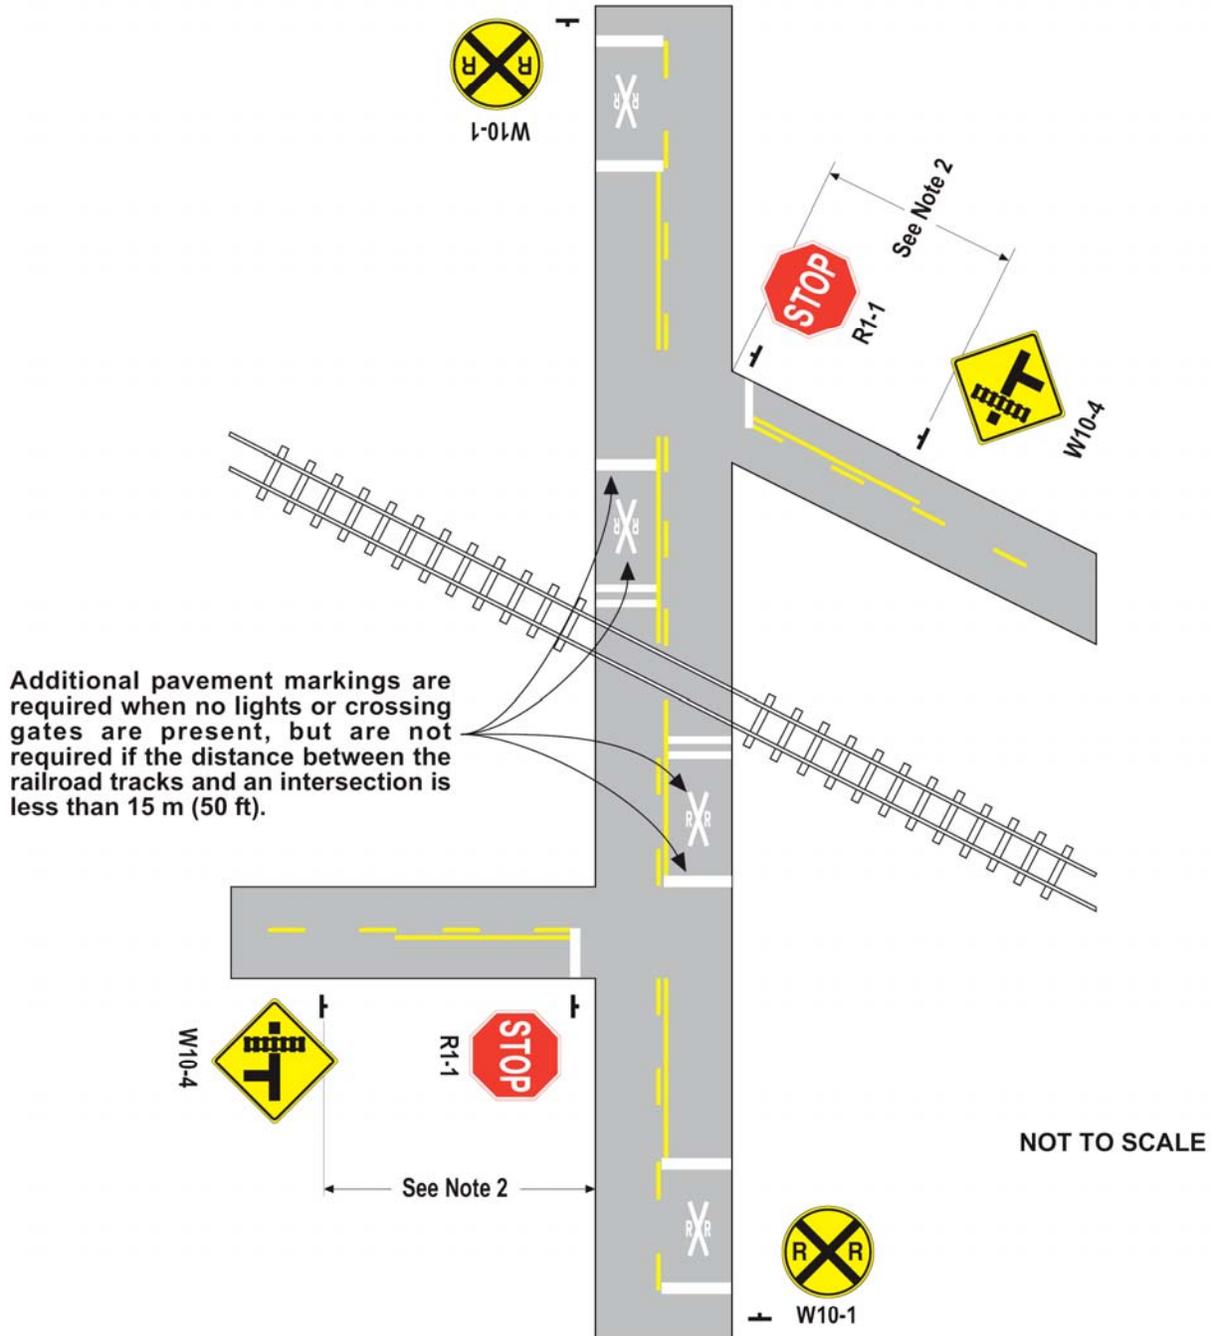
B-6 (CA). Example of Placement of Warning Signs and Pavement Markings at Highway-Rail Grade Crossings (Sheet 3 of 4)
